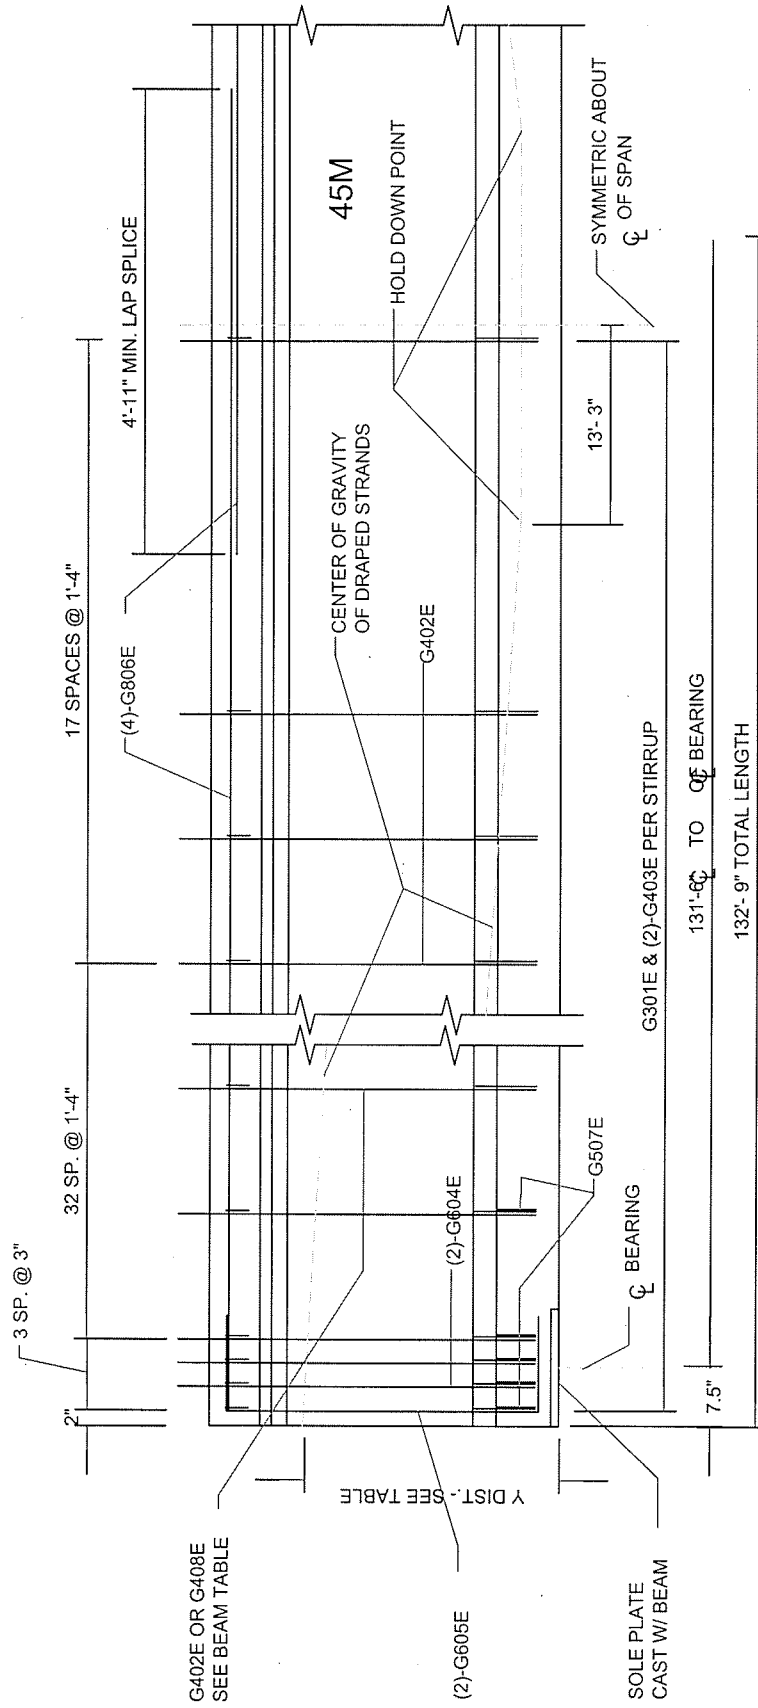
Test Girder Mild Steel Reinforcement, Elevation (reprinted from Kielb, 1994)
